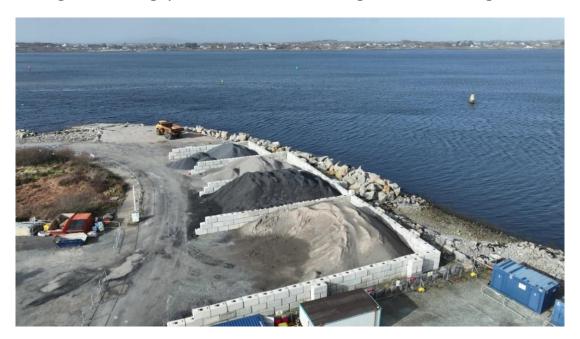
Storage areas for the construction materials and supplies for the concrete production plant adjacent to the construction compound.
